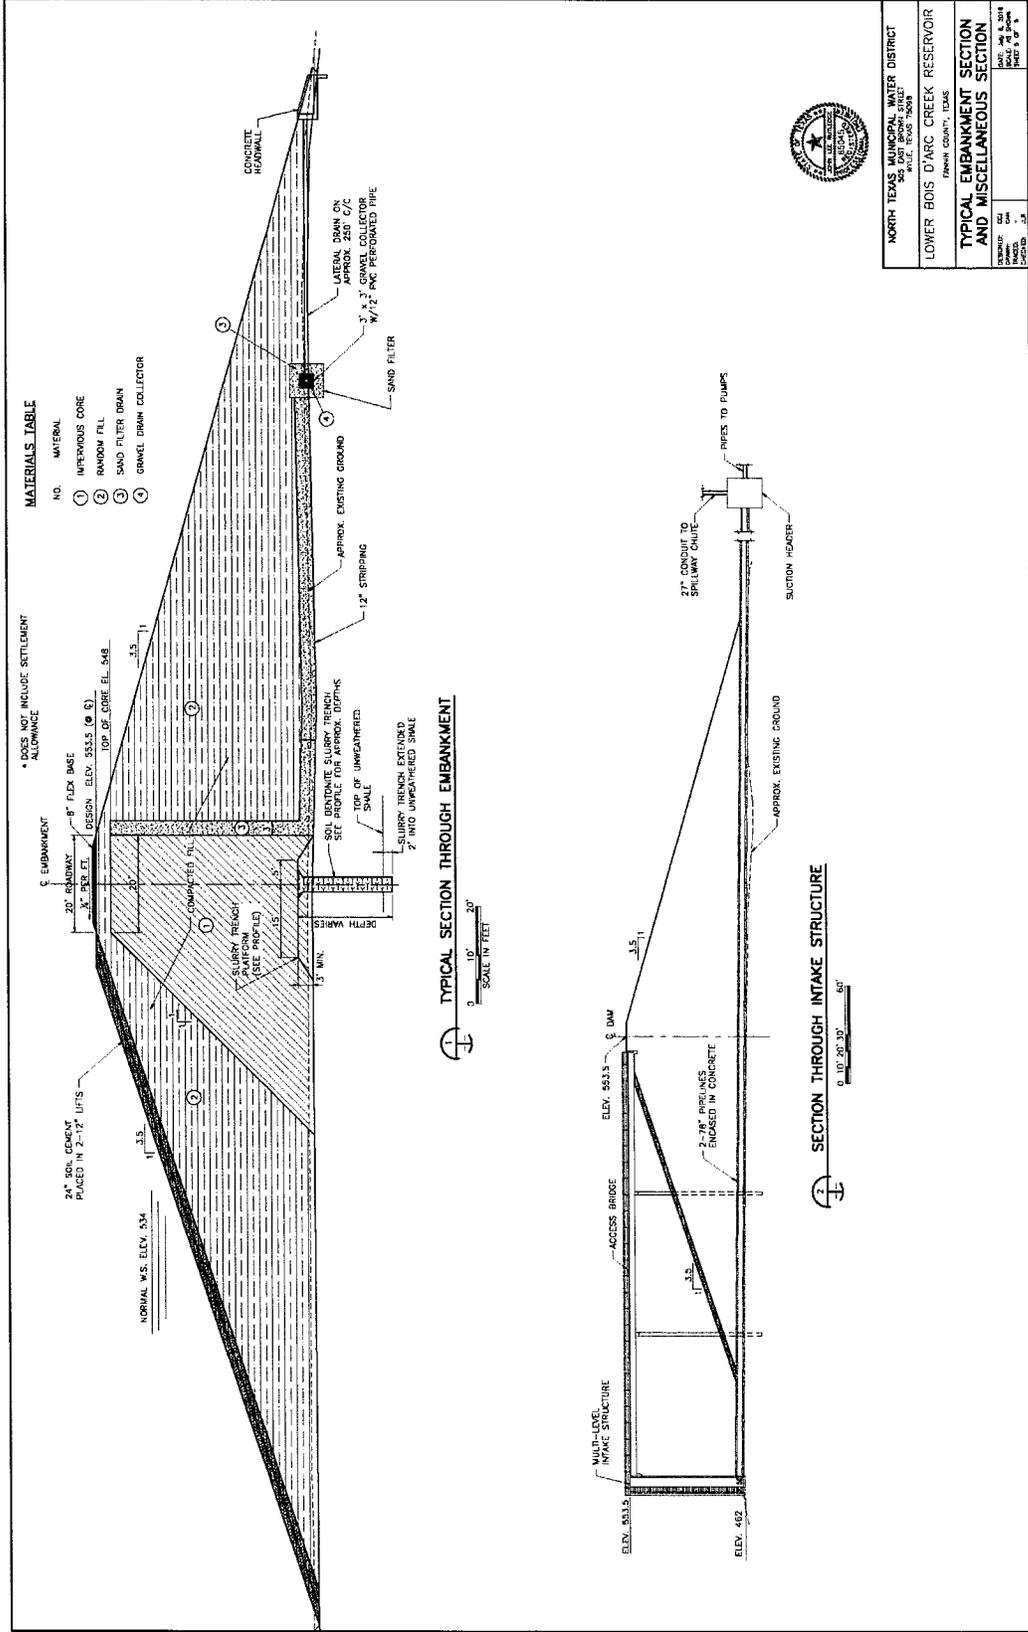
Preliminary Drawings of Lower Bois d'Arc Reservoir Dam Cross-section
